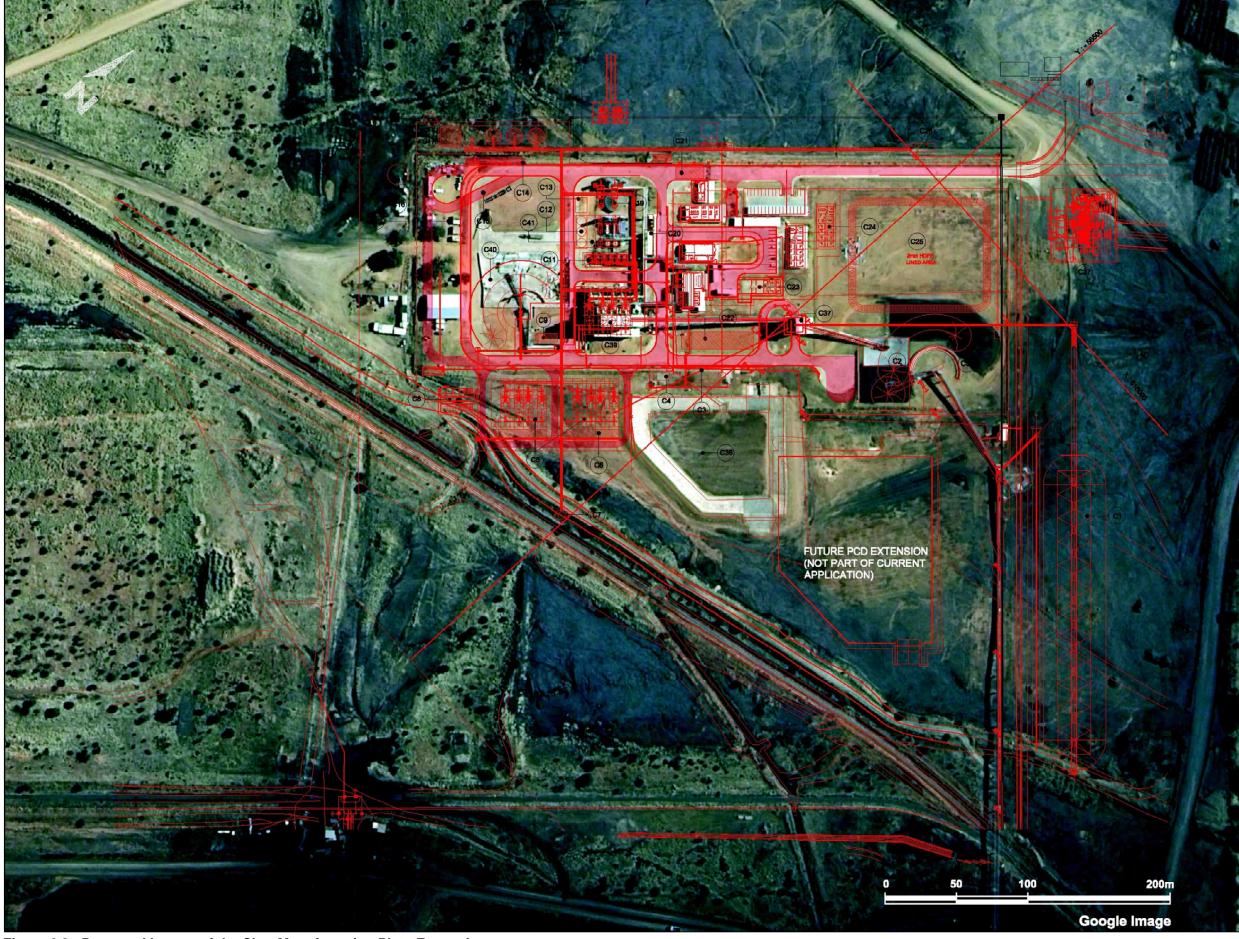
Proposed Layout of the Char Manufacturing Plant Expansion
